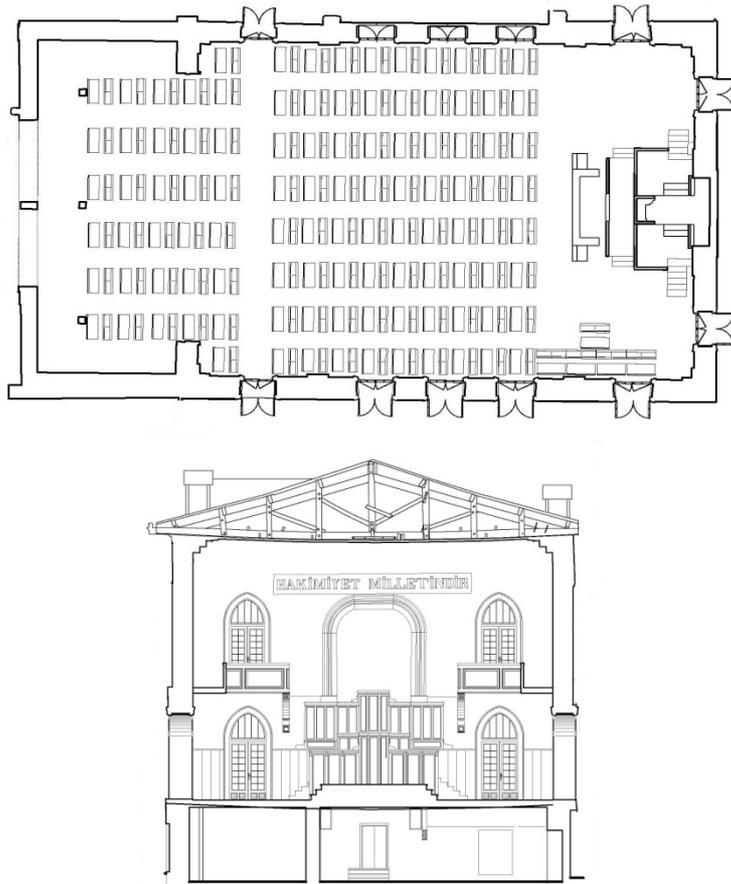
General Assembly Hall (Main Hall) in plan and section [5].
